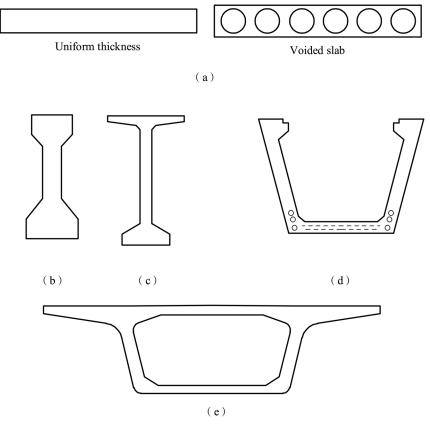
Cross-sections of girder bridges: (a) slab (solid or voided); (b) I-shape; (c) T-shape; (d) U-shape; (e) box-shape.
